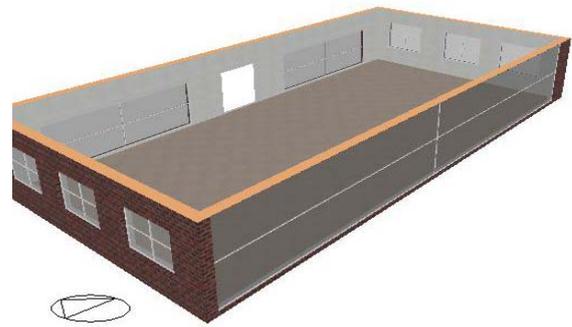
South South West View of Office Building illustrating interior (Graphic)
